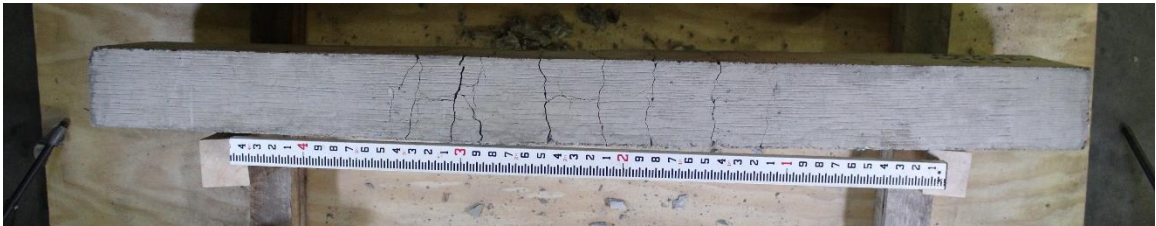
Mixture 5 (10Q10FA2) beam #1R: concrete beam bottom view.
